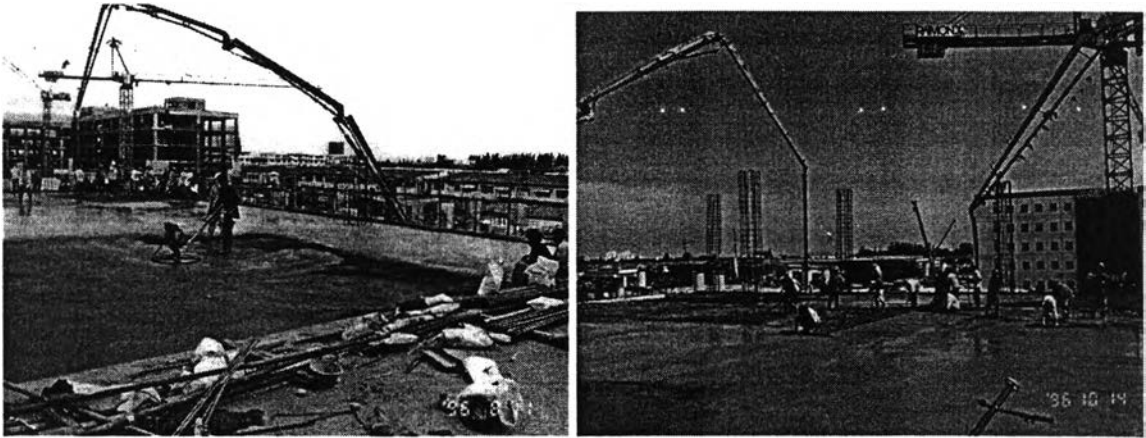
A concrete pump is an effective machine for concrete placing on second floor.
